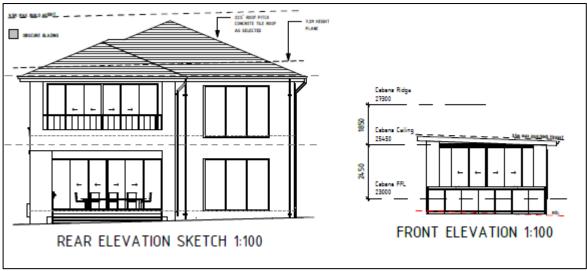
Rear elevation of dwelling and front elevation of cabana.
